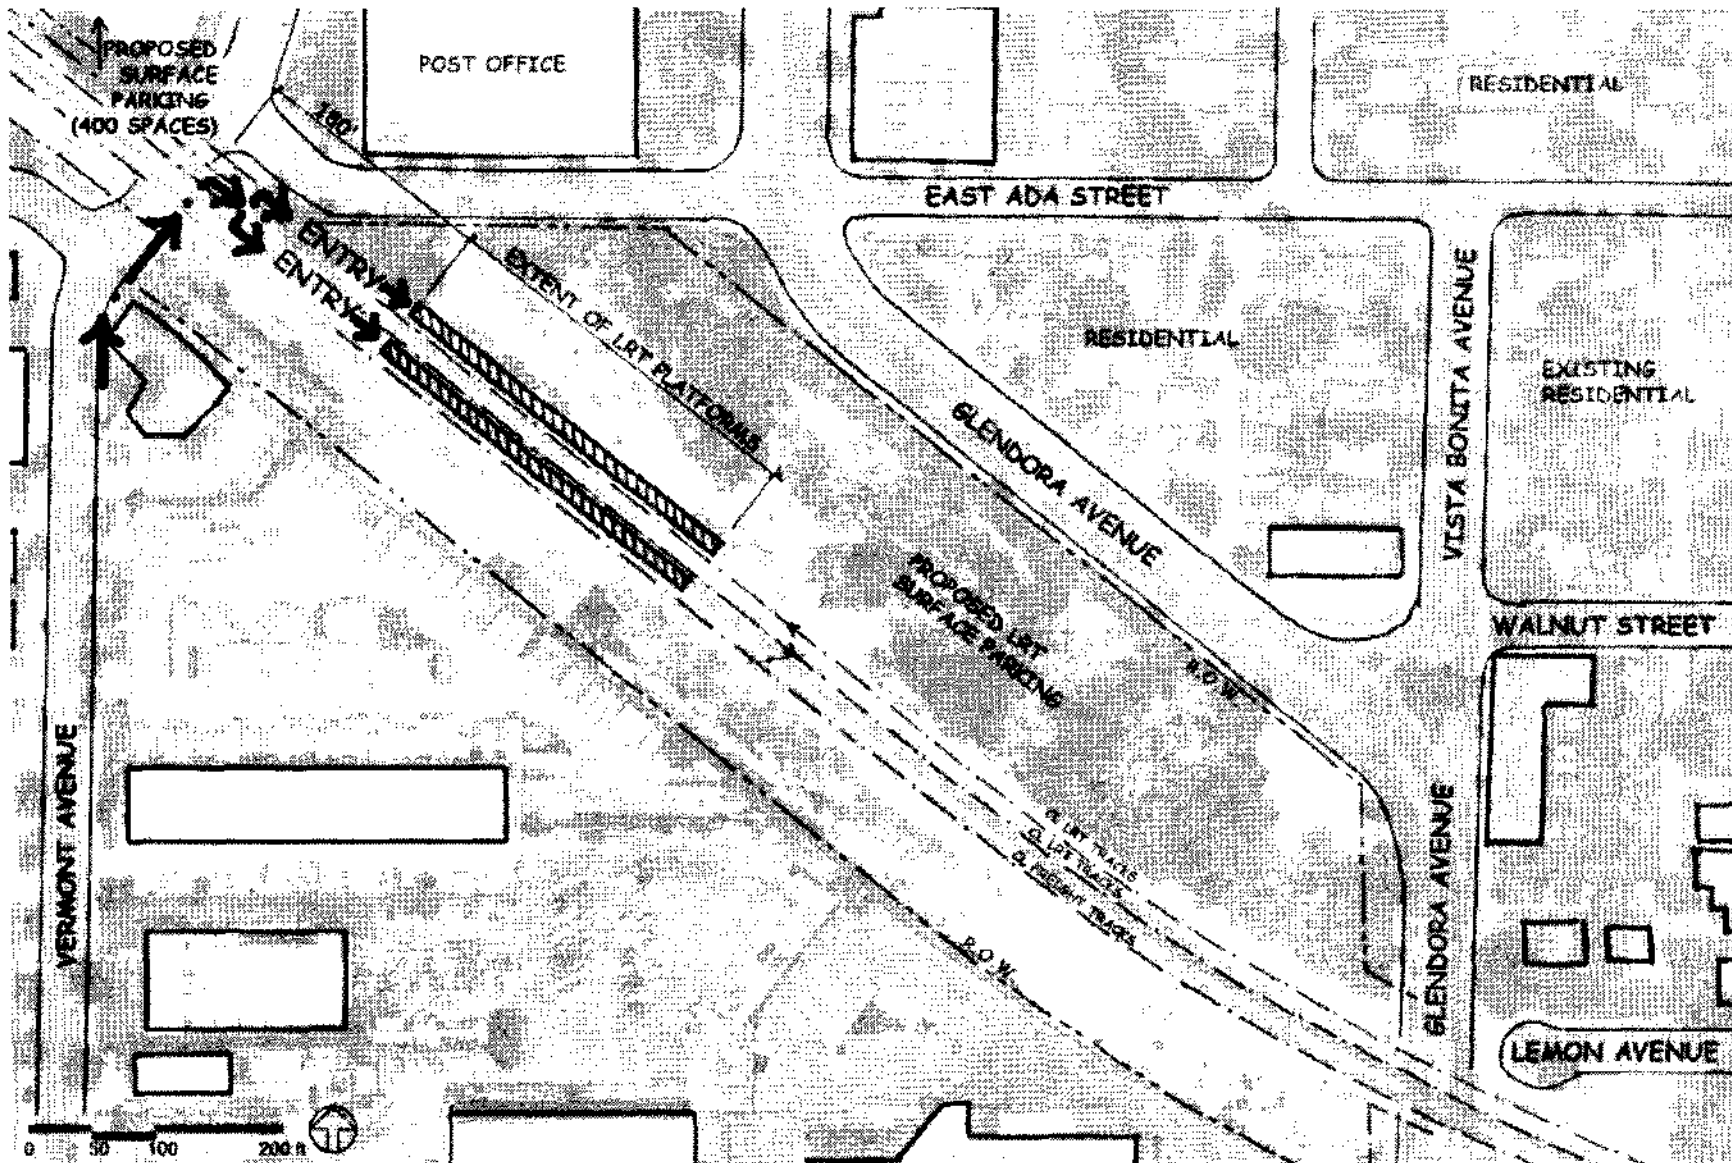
Site Plan: City of Glendora Station, 3-Track Alternative
